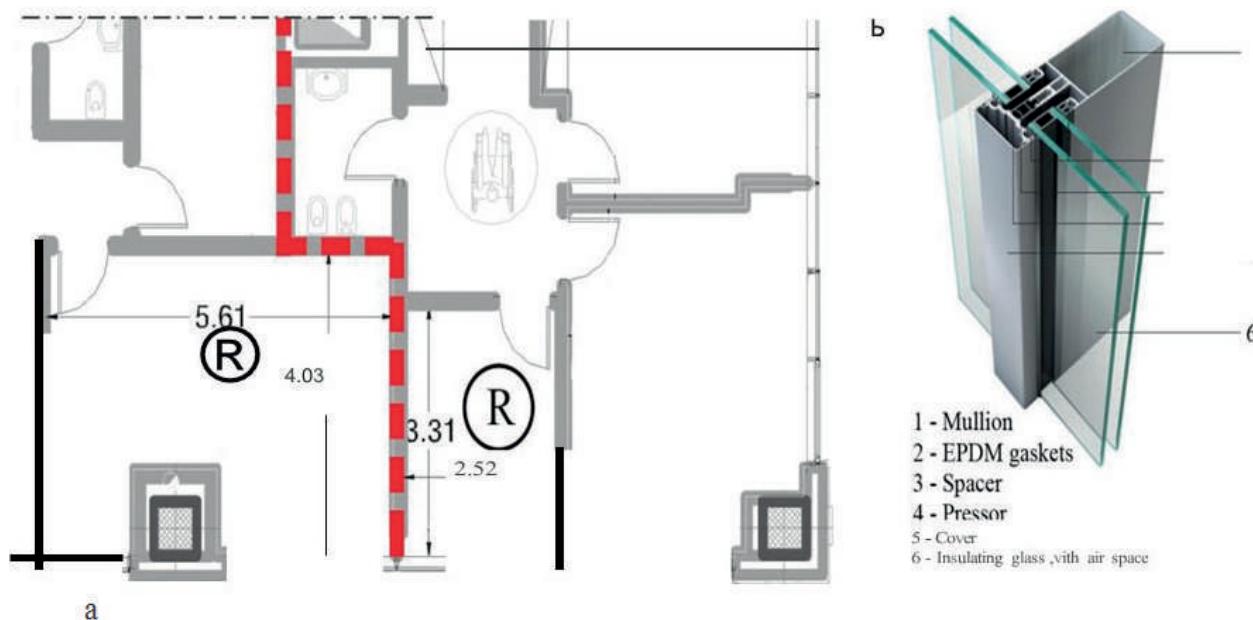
(a) Plan portion of the building under test where: S = source room, R = receiving room, dashed line is the limit of two distinct properties; (b) detail of the curtain wall structure.
